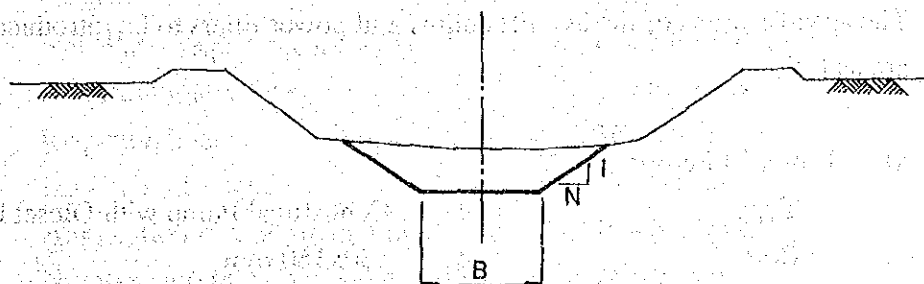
Typical Cross Section for Canal Re-excavation
